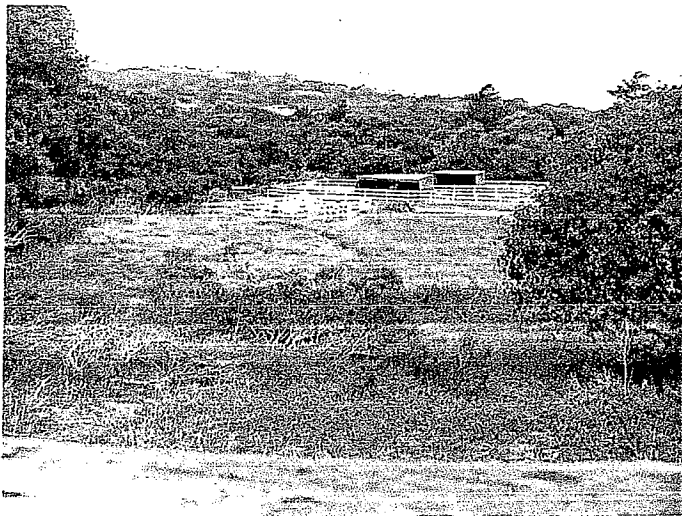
View of area down slope of proposed pool area, showing construction access area. May 2008
